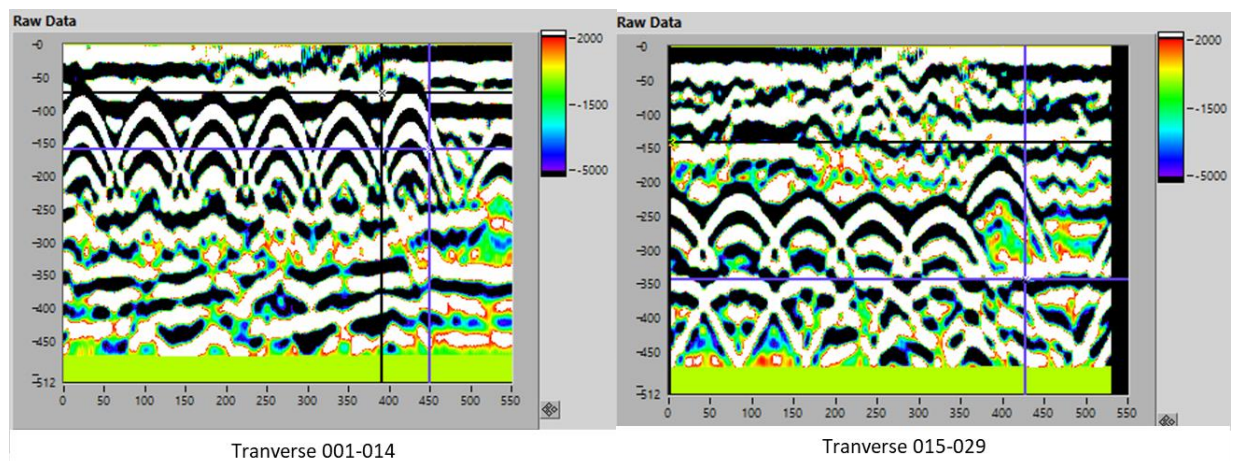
Radargram of 2GHz GPR test survey on the casted CEE concrete wall with diameter 20mm rebars
